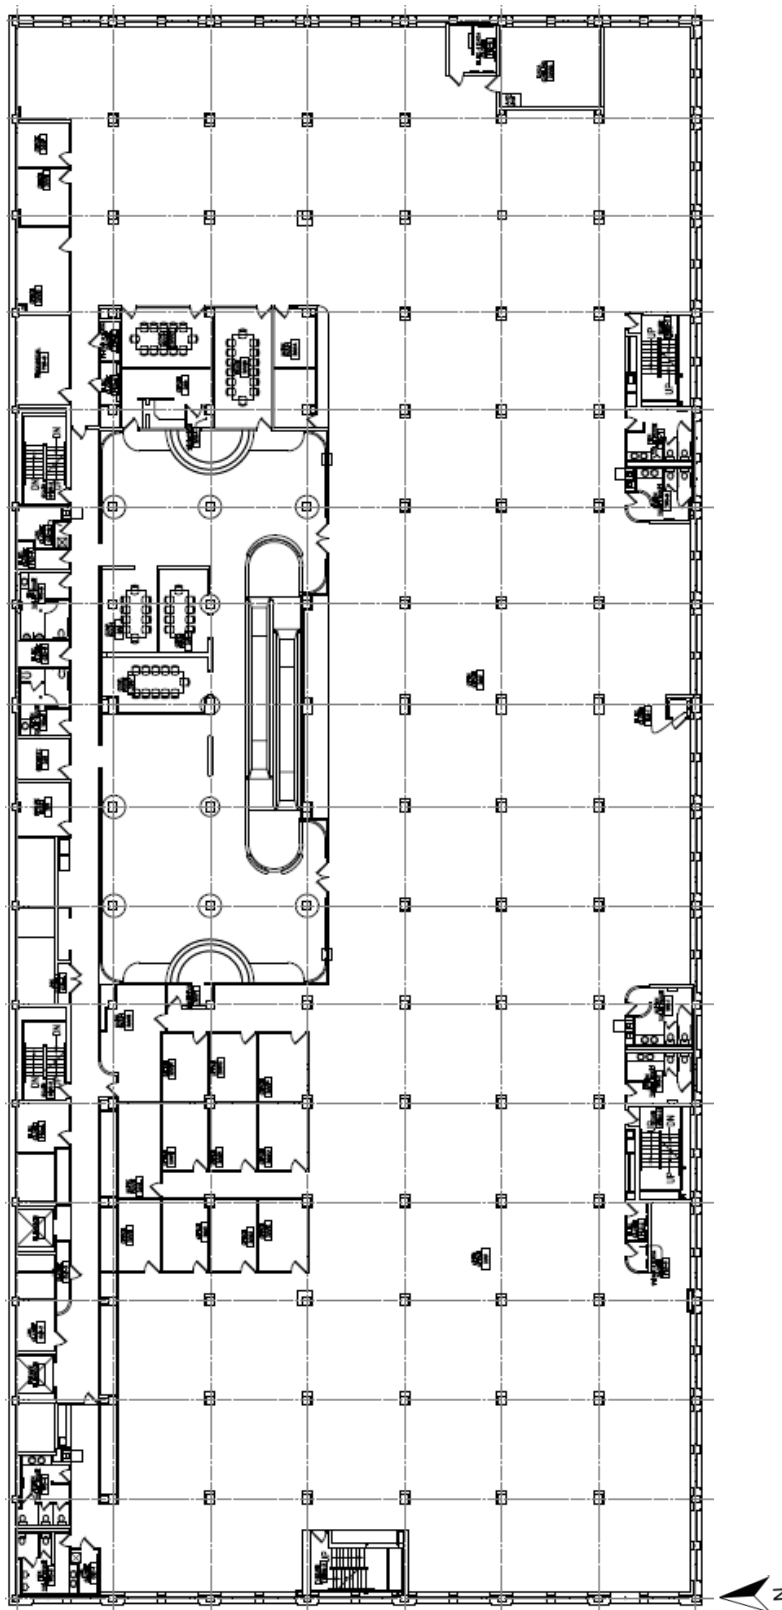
Current Second Floor Plan (Quorum Architects). Not to scale.
